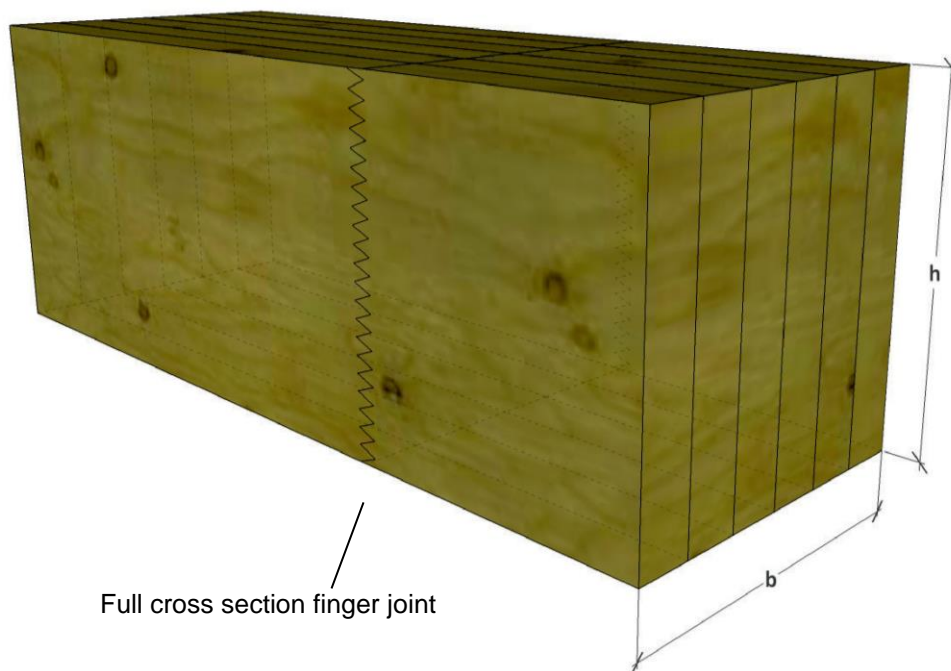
Basic structure of glued laminated timber with full cross section timber joint - homogeneous lay-up
